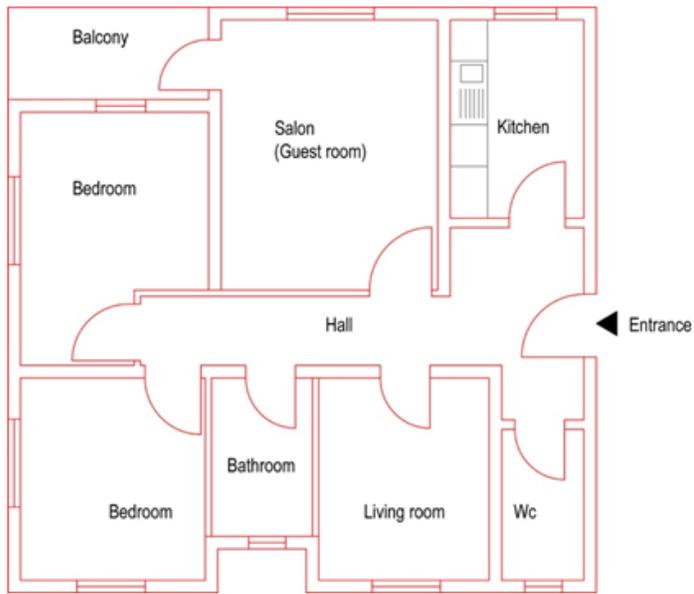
a representative plan of Typical Dwelling in Ulubey neighbourhood/ Turkey
